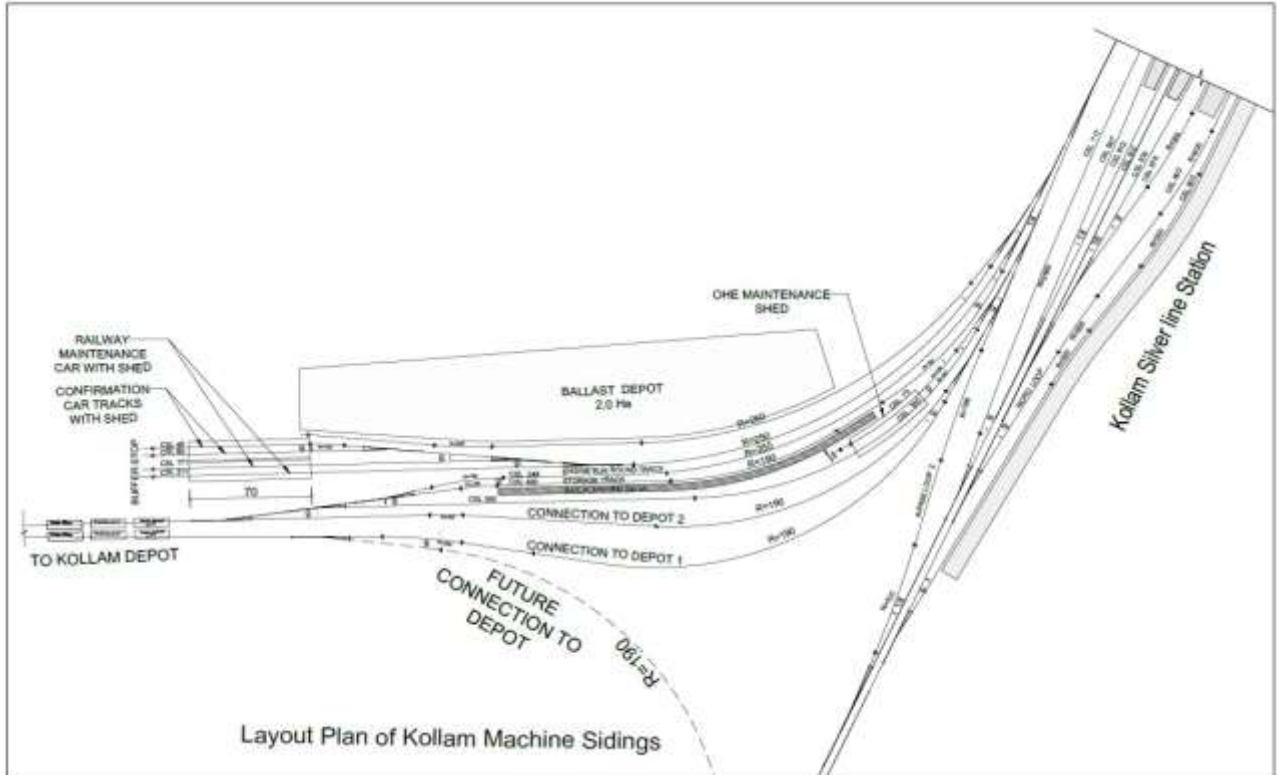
A sketch showing the Machine Siding proposed at Kollam Depot
